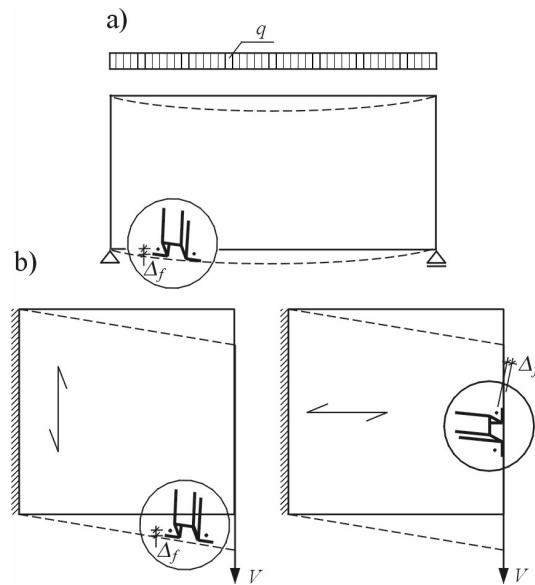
Sheet deformation scheme in: a) freely supported roof, b) cantilever panel with different arrangement of sheets
